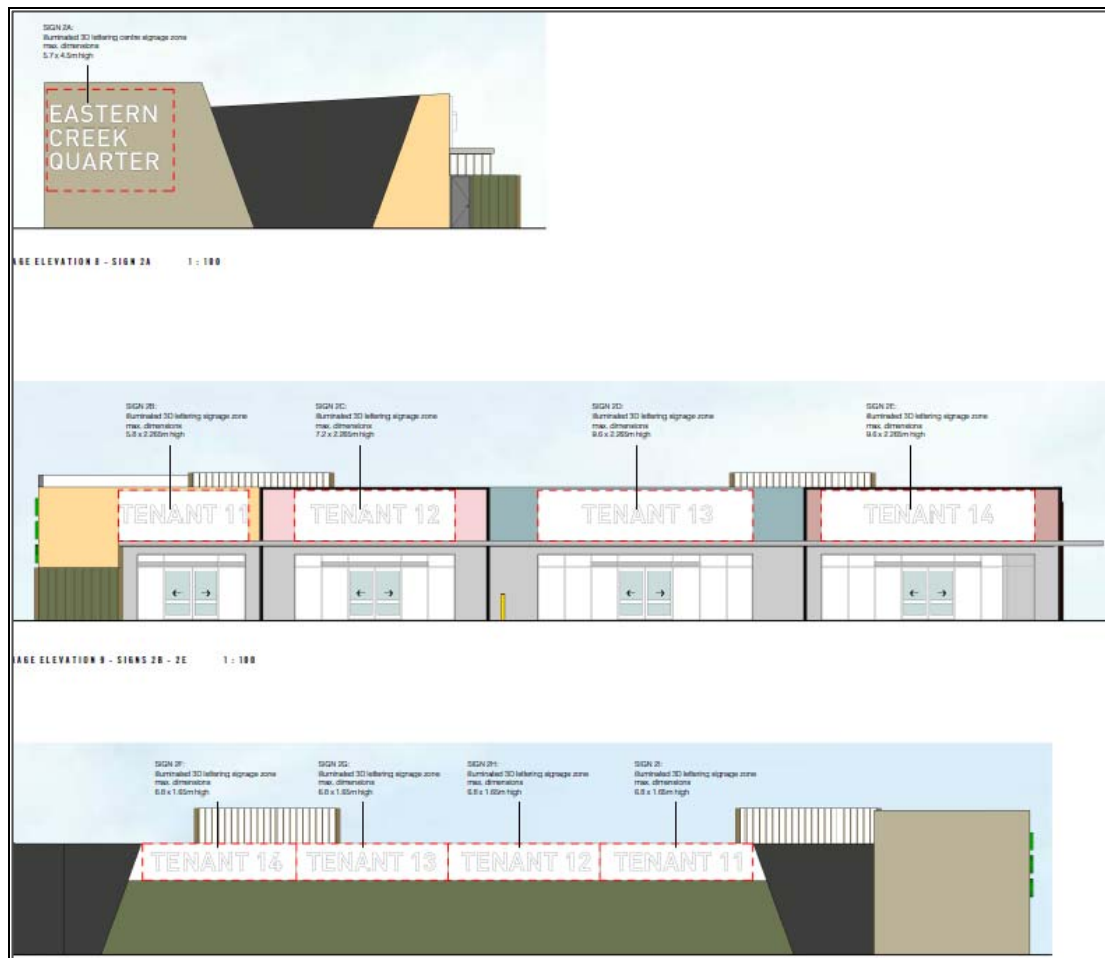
| Proposed site signage and tenant front and rear signage zones, Building 2.
